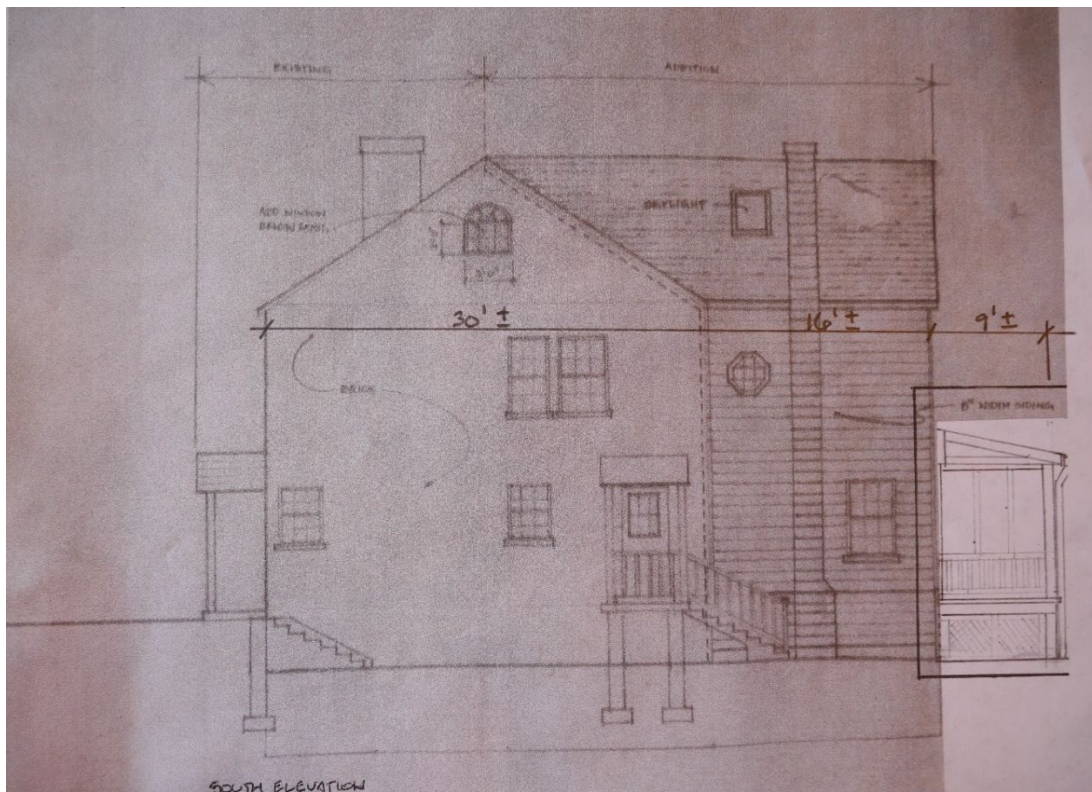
The right-side elevation of the residence as it will appear on the broader elevation.
